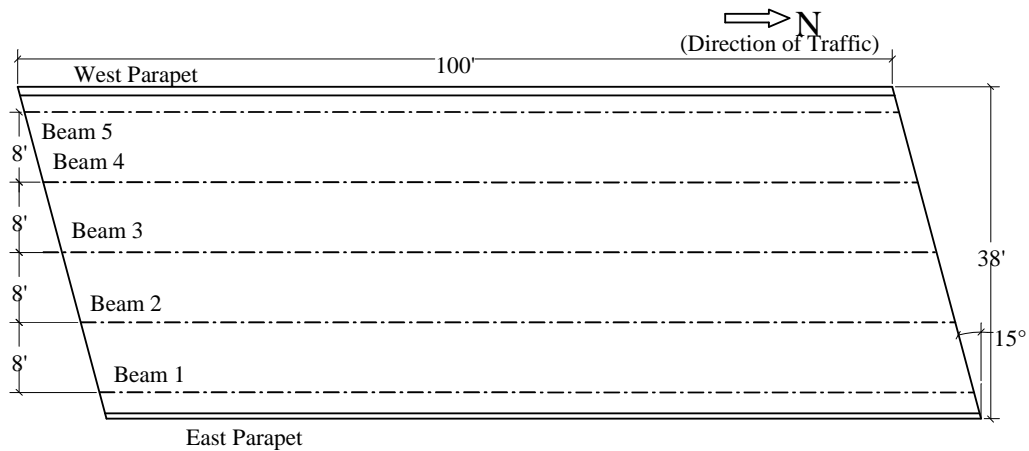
Plan View of the Instrumented Span - Slaughter Creek Bridge
